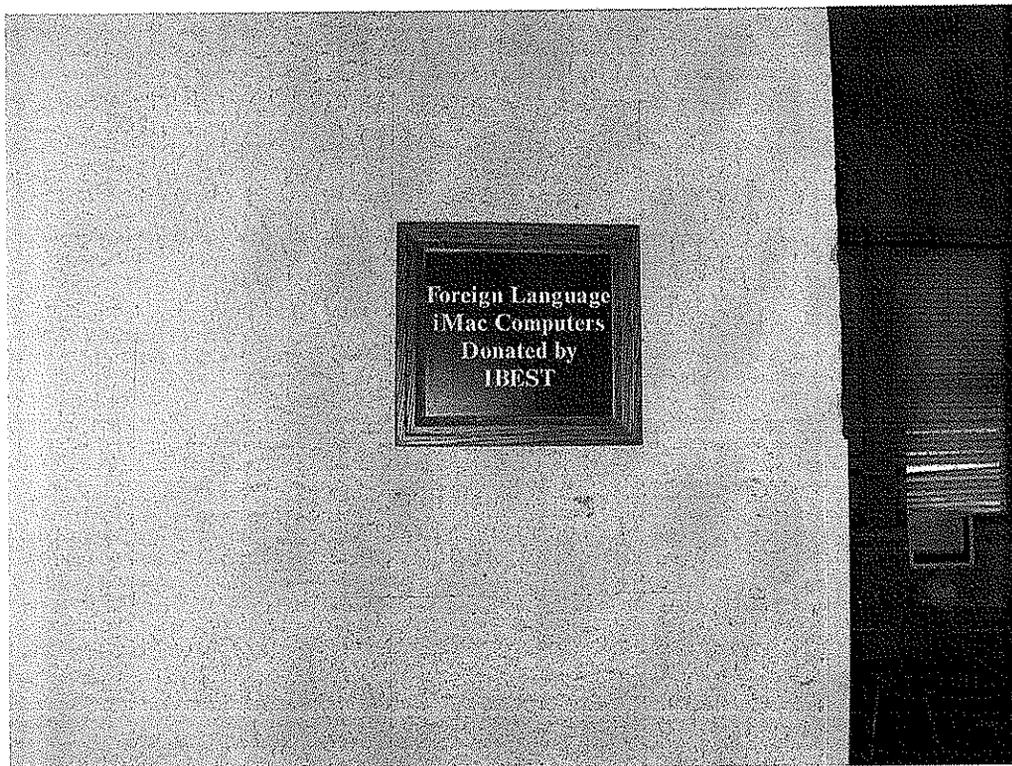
No asbestos was detected in the 12"x 12" glued-on ceiling or wall tiles.
